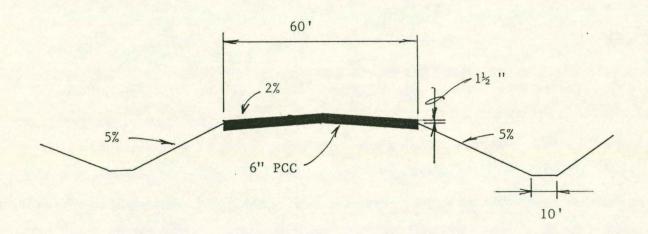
PAVEMENT DESIGN, RW 13/31
